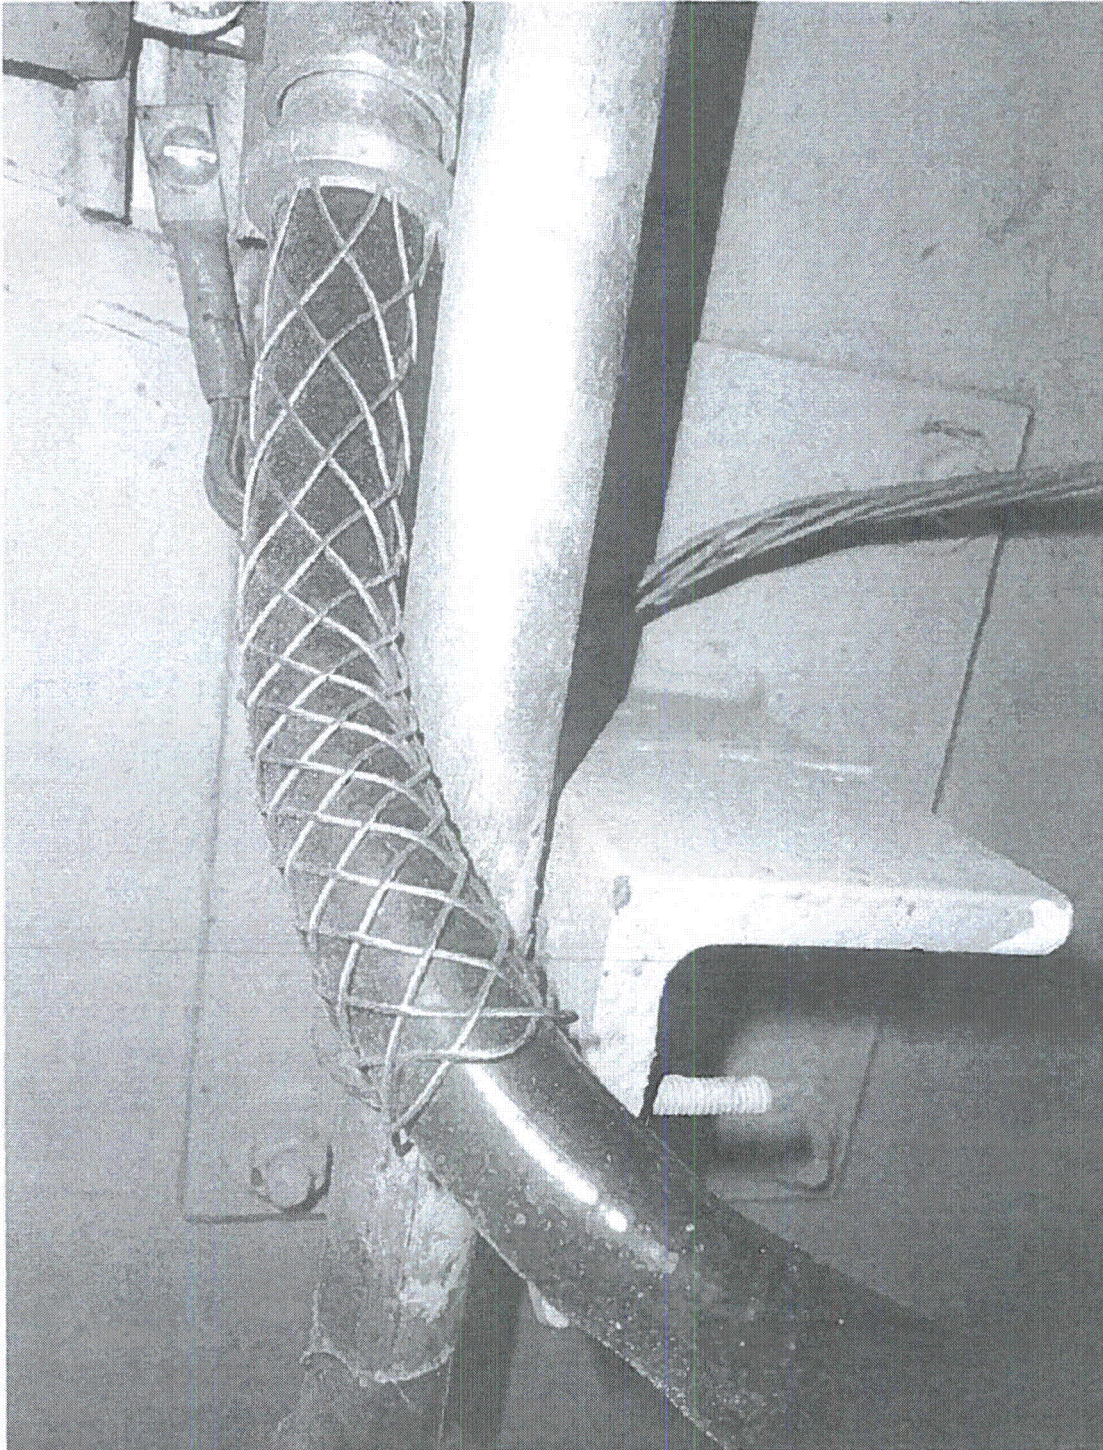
First Conduit Pair with Limited Gap (Unit 2 Torus Room Bay 9)
